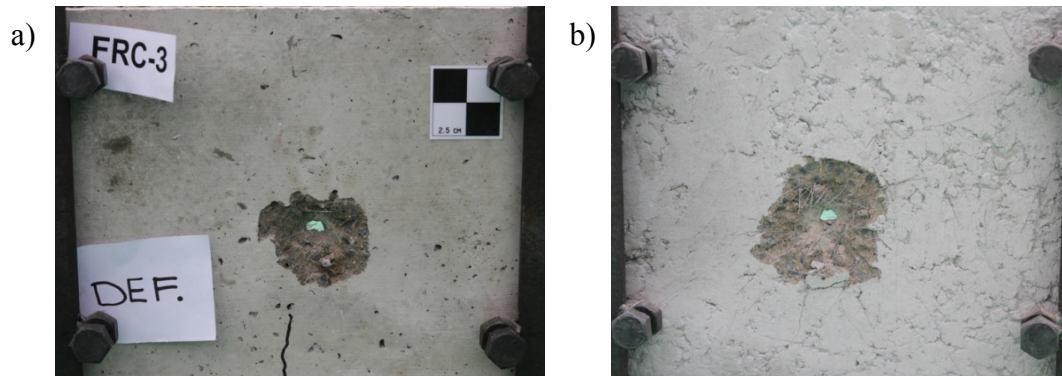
Damage on specimens made from FRC: front face damage (a) and rear face damage (b).
